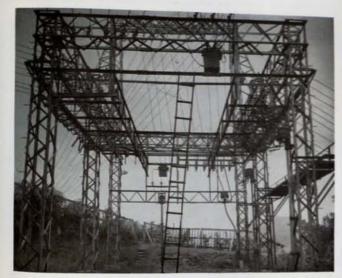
10,500 feet from GZ. 3.5-kilovolt switch rack, Akunoura Substation.
